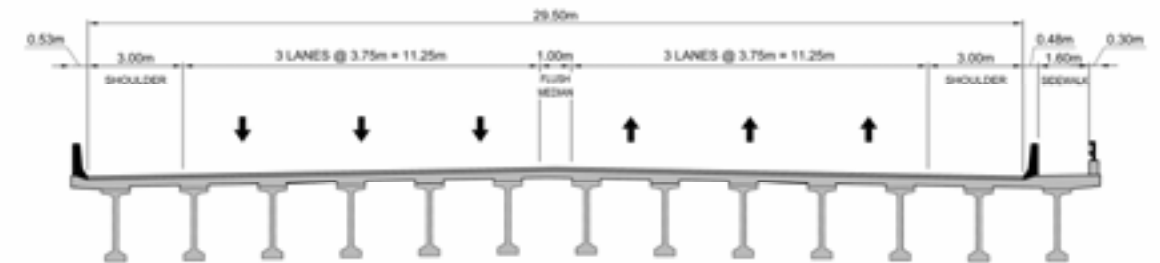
TYPICAL CROSS-SECTION – APPROACH BRIDGE
